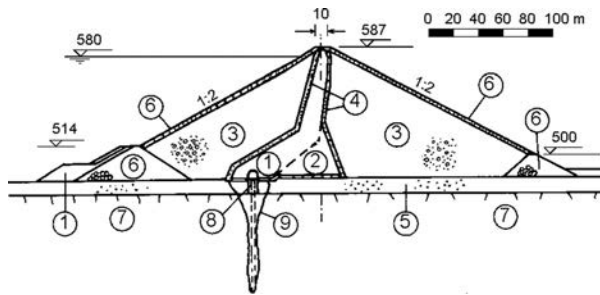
Cross-section of Shpilje dam (Macedonia). (1) Clay core; (2) clayey gravel; (3) gravel; (4) filter layers; (5) river sediment; (6) coarse rockfill; (7) limestone; (8) caisson diaphragm wall with grouting gallery; (9) grout curtain.
